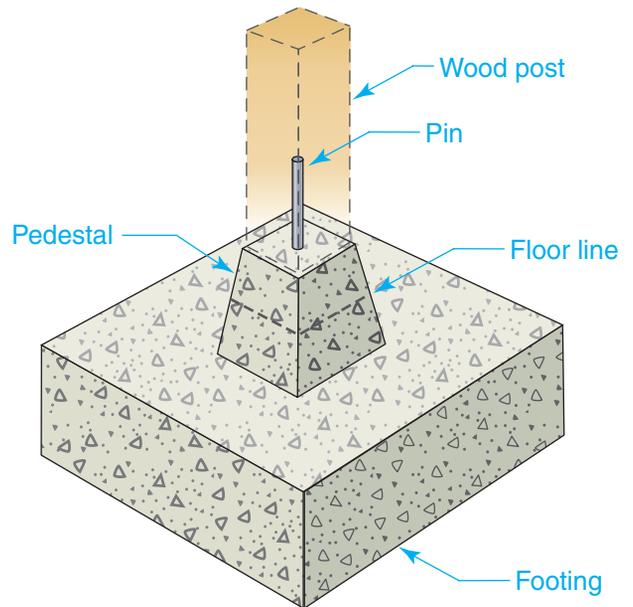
Pier Footing Post Support A steel pin can be used to anchor a post, but many builders use a metal bracket instead.
